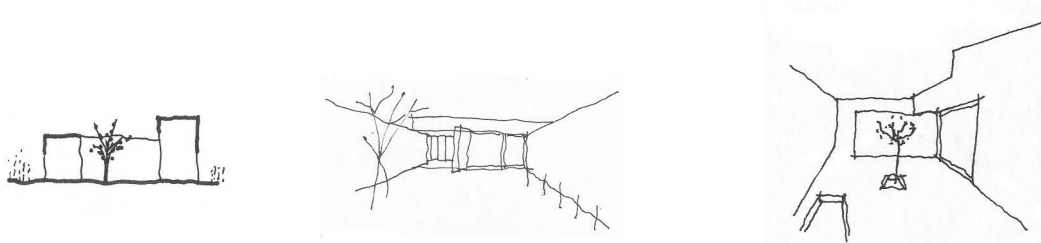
Interrelationship between inside and outside; Fig. 7.60 Outside room; Fig. 7.61 Building frames immediate landscape
